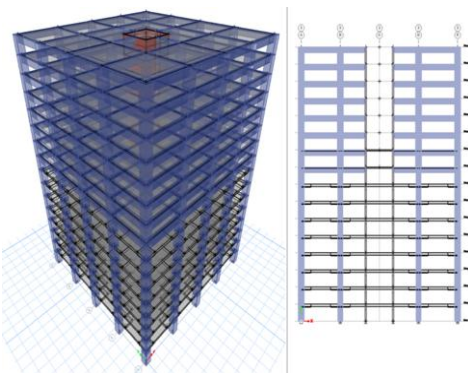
3D View and Elevation G+15[8F8BWDC]
